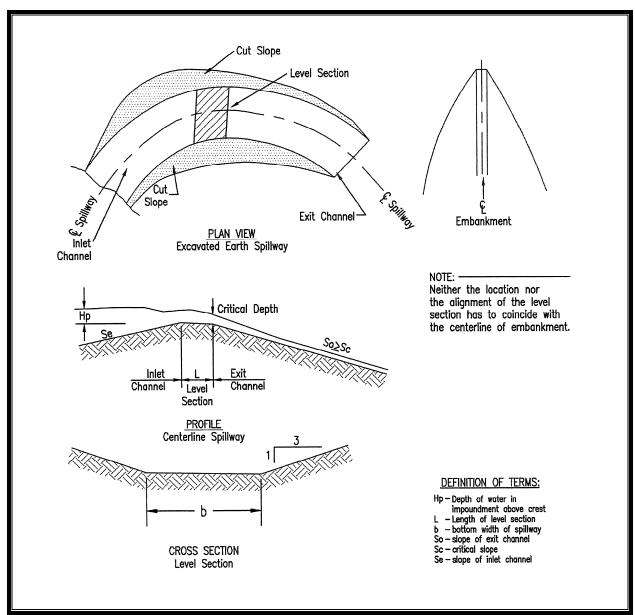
Typical Plan and Profiles Along the Centerline of an Earth Spillway
